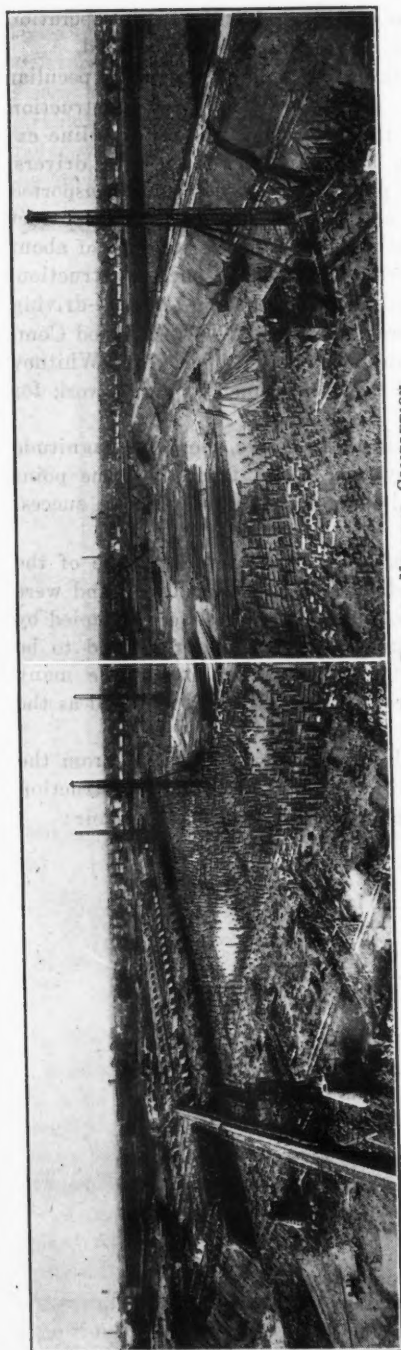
EXCAVATION AND PILE-DRIVING NEARING COMPLETION
